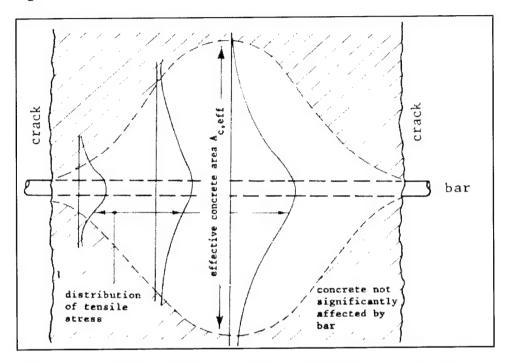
Conceptual illustration of transfer of tensile stress from steel bar into concrete between cracks
